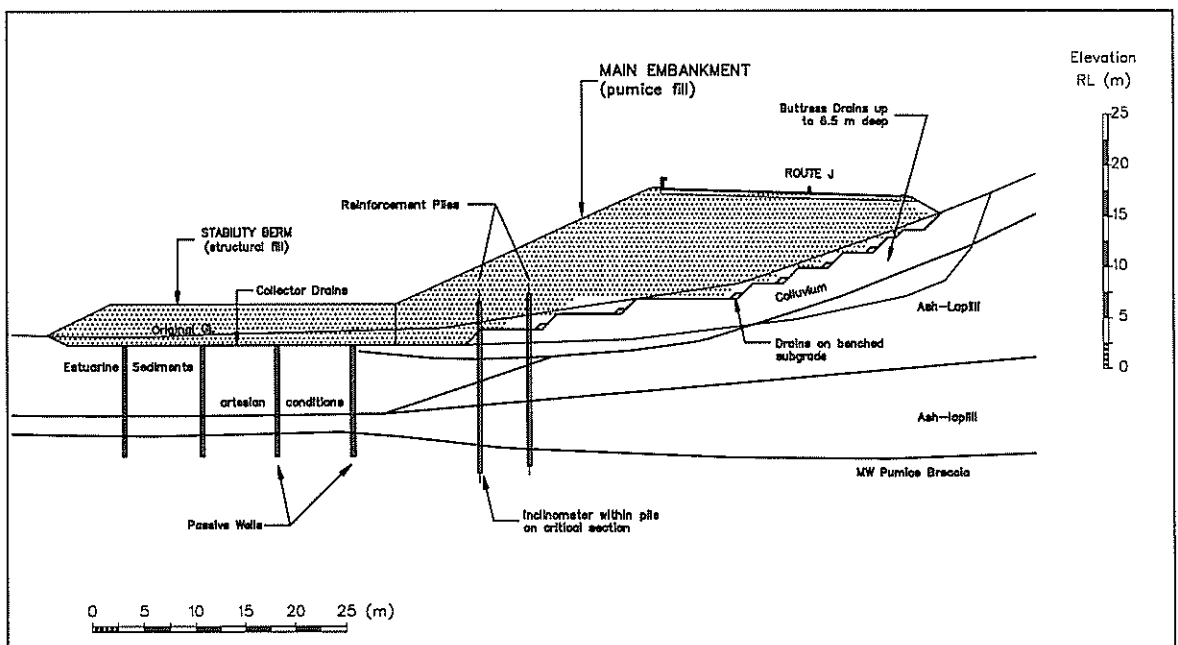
(b) : Embankment Design Section, approx. Sta 2300 m
